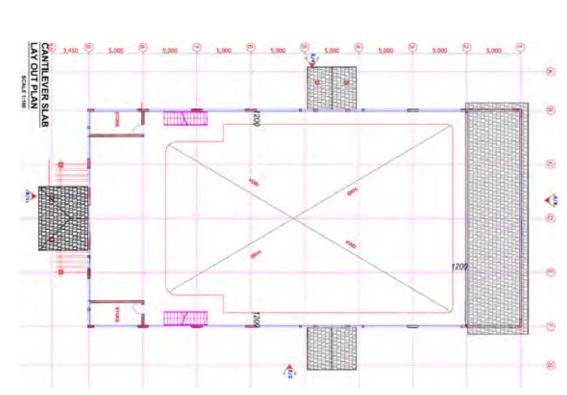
Mezzanine Floor Plan of the Multi-purpose Hall
